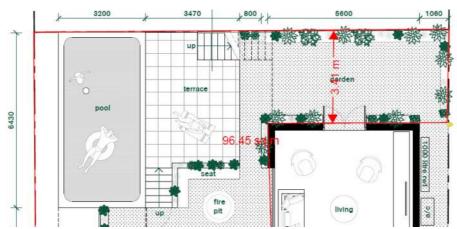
Extract from applicant's plans illustrating outdoor area on second level.
